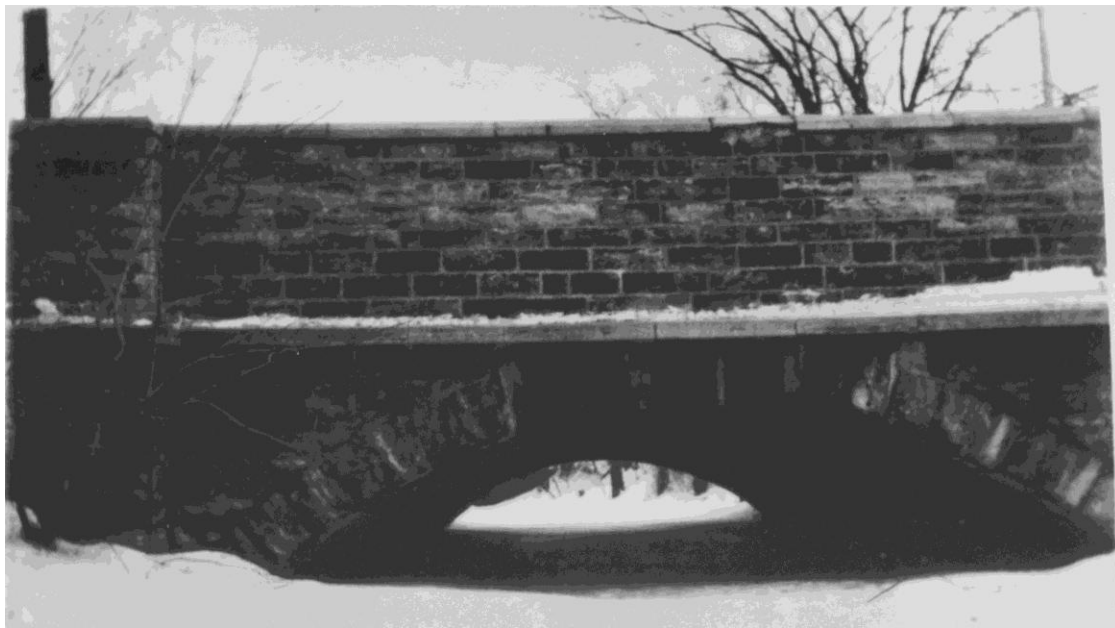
Old Booth Street Bridge, 1968. The bridge parapets and width of the arch appear to be the same as it was in the 1903. Source: City of Ottawa Archives, Ottawa Water Works MG305, Accession 40D91.
